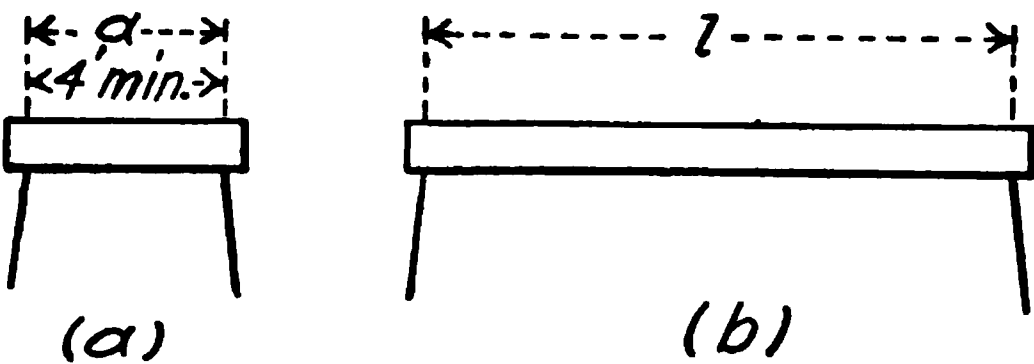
MASONRY PIERS FOR ELECTRIC RAILWAY BRIDGE, SCHNEIDER'S STANDARDS.
